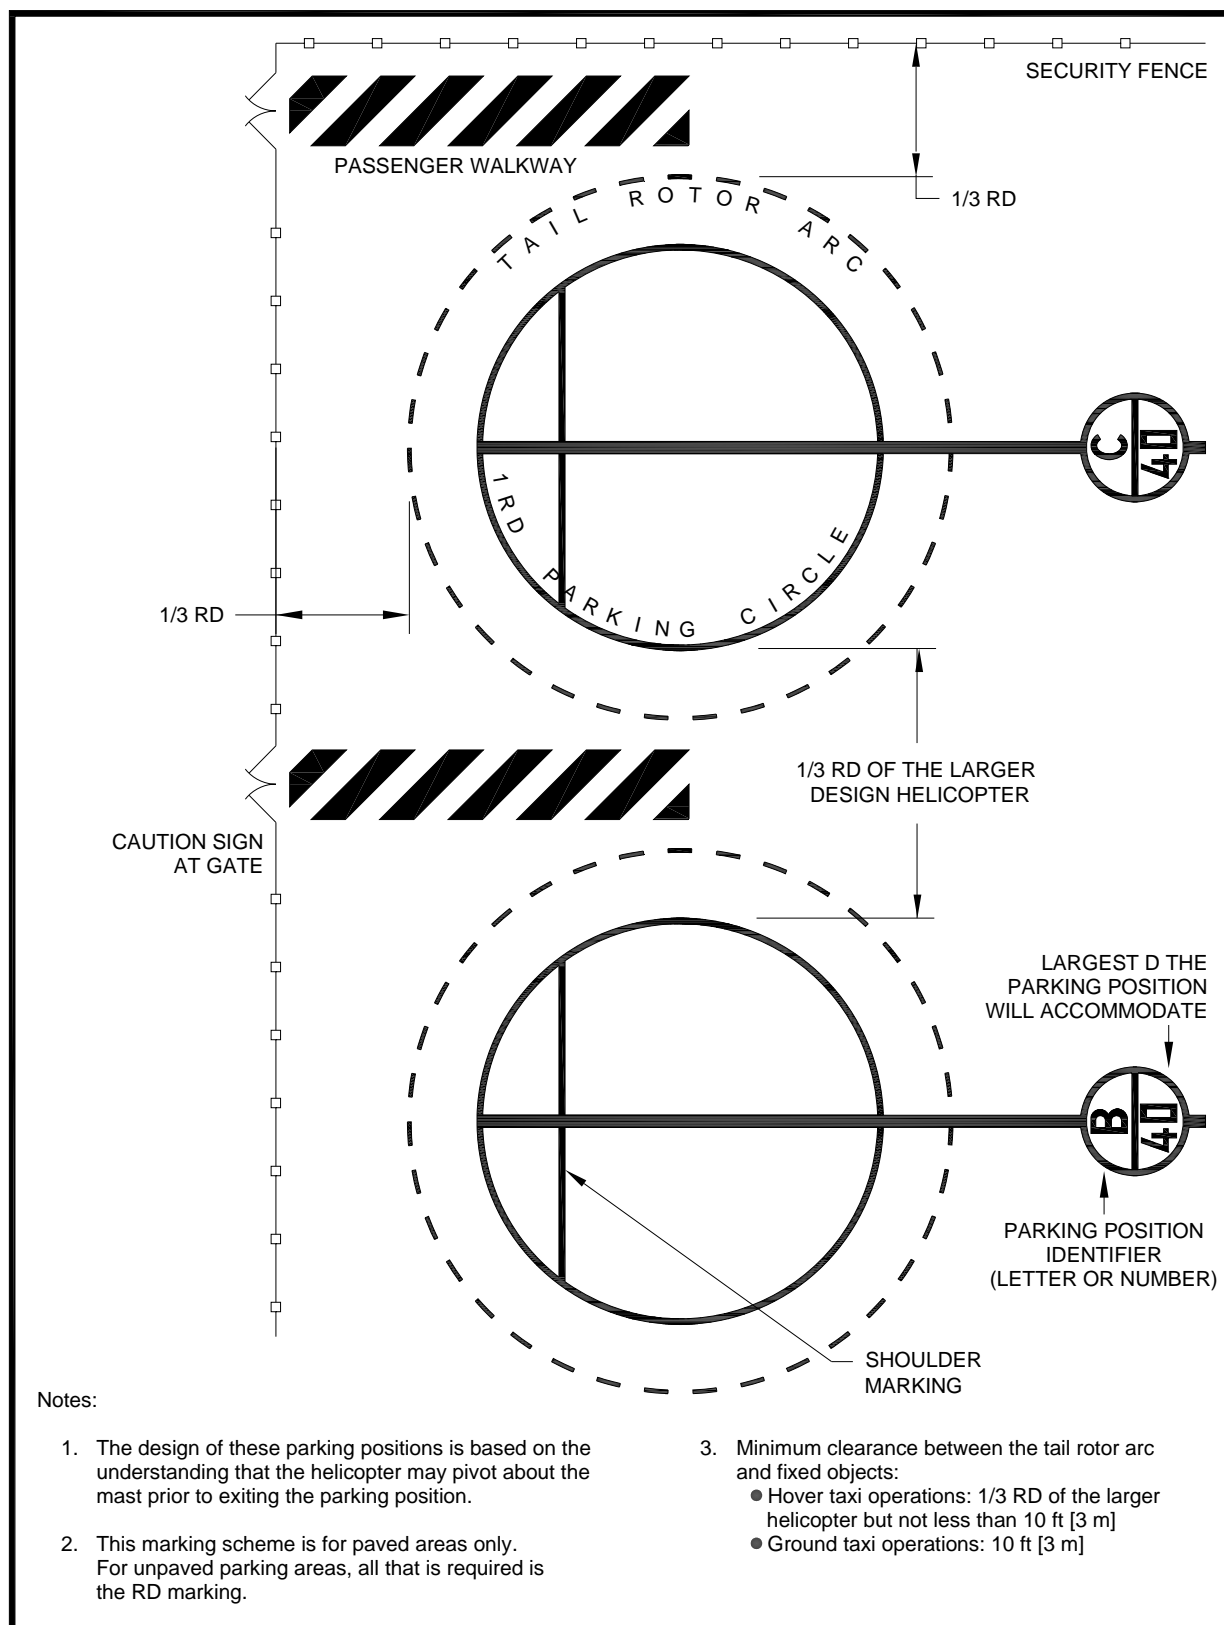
Parking Area Design – “Back-out” Parking Positions:
